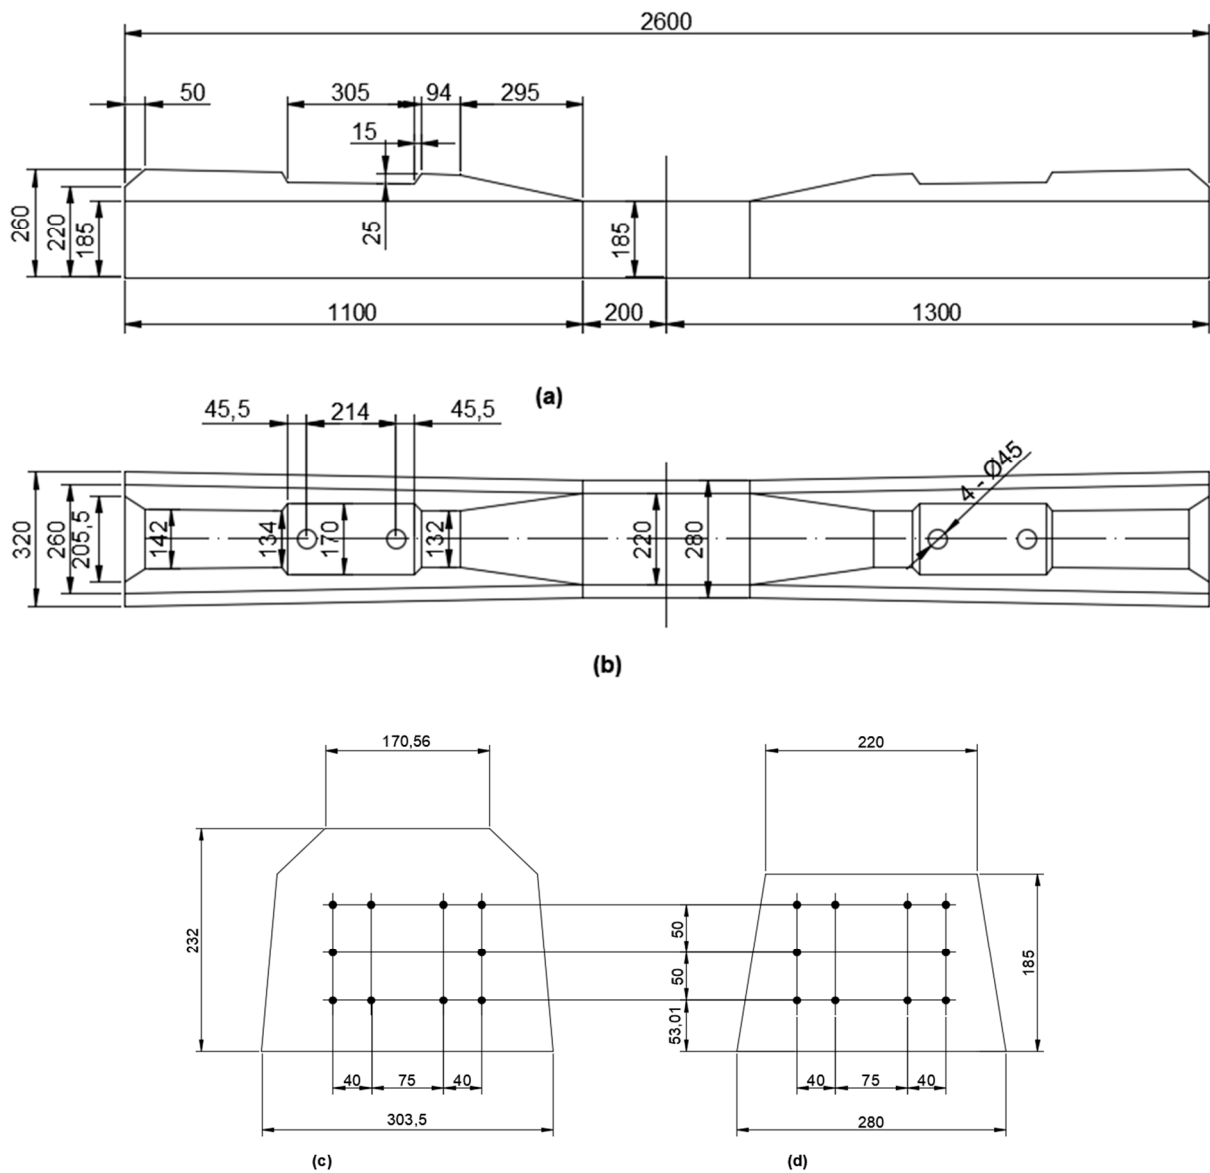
Geometric details of the Chinese Type III prestressed concrete sleeper: (a) Front elevation; (b) Plan; (c) Rail seat section; (d) Midspan section.
